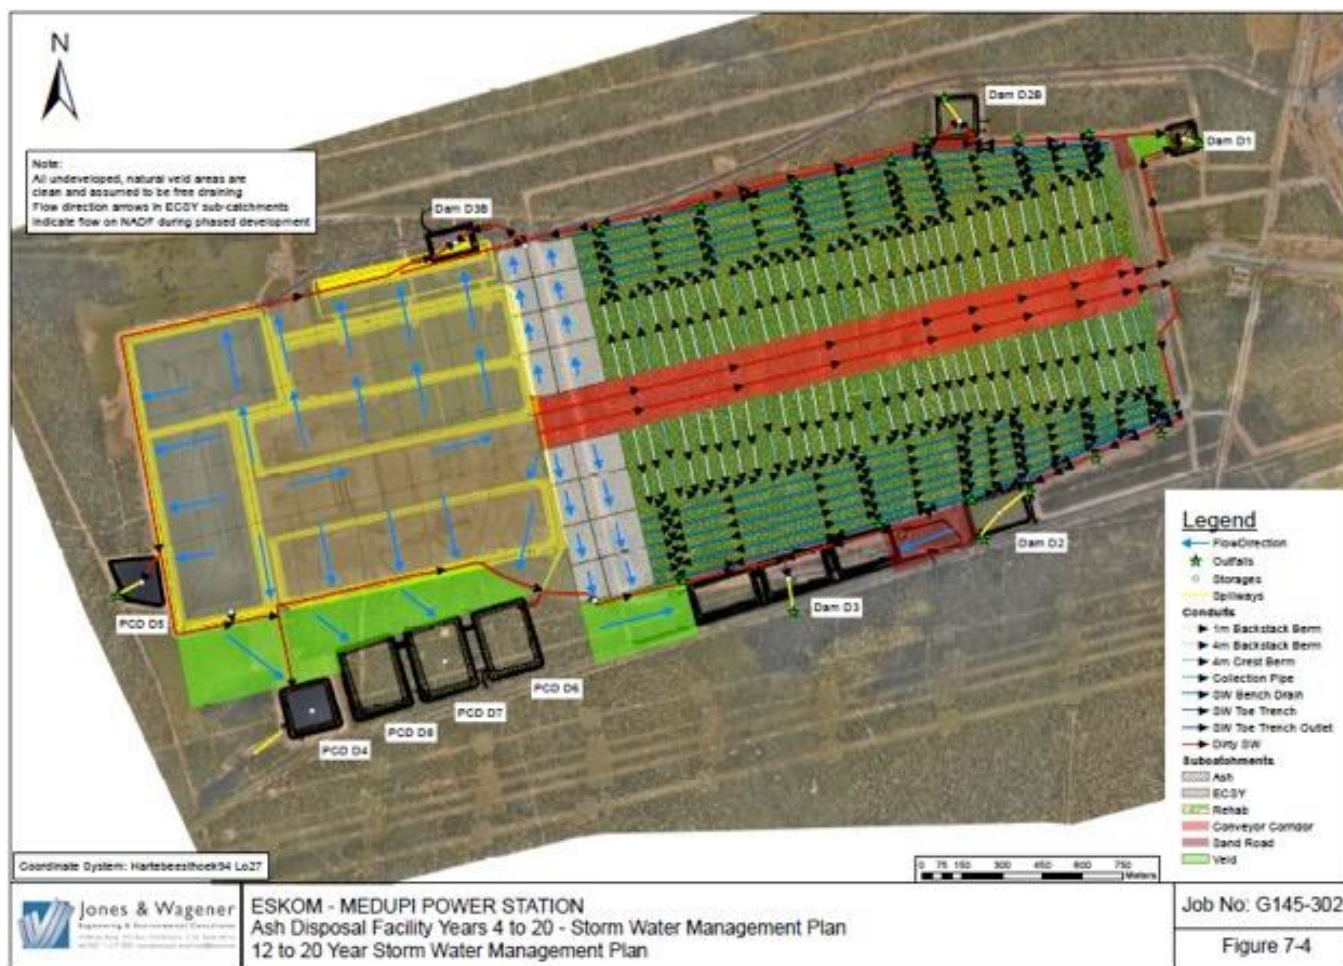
Existing and licensed ADF as well as the associated dams and proposed storm was management plan
